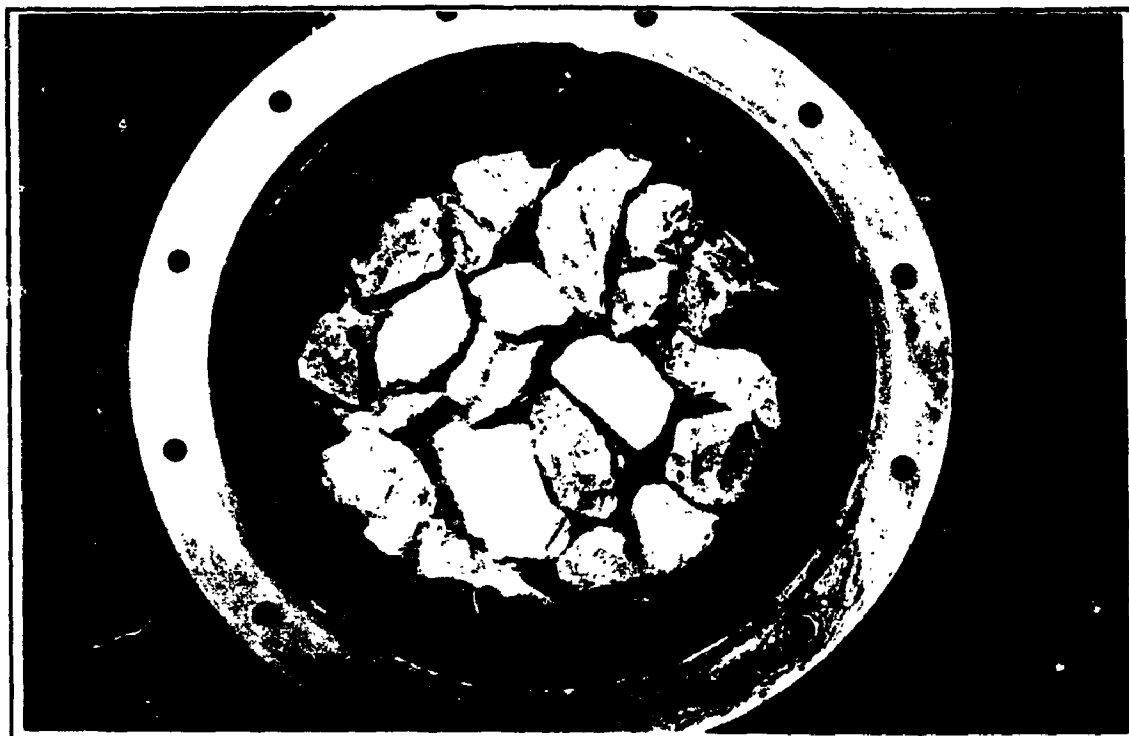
50 mm STONE PLACED ON GEOTEXTILE SPECIMEN (TESTS #1, #2, AND #3)
